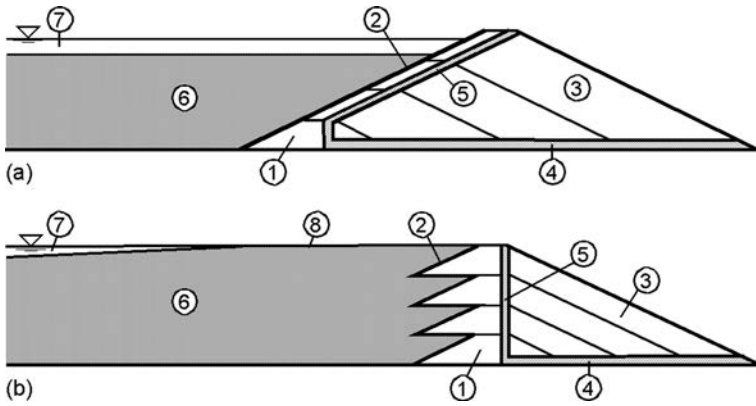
Downstream (a) and centerline (b) method of construction of tailings dams. (1) Starter dam; (2) impervious zone; (3) sand dam, constructed in stages; (4) base drainage layer; (5) chimney drain, constructed in stages; (6) slimes; (7) pond (or pool, area of supernatant liquid in the impoundment); (8) beach.
